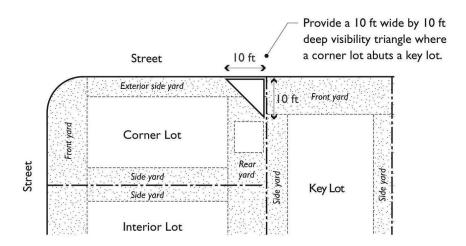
DC: CORNER LOT ABUTTING A KEY LOT
